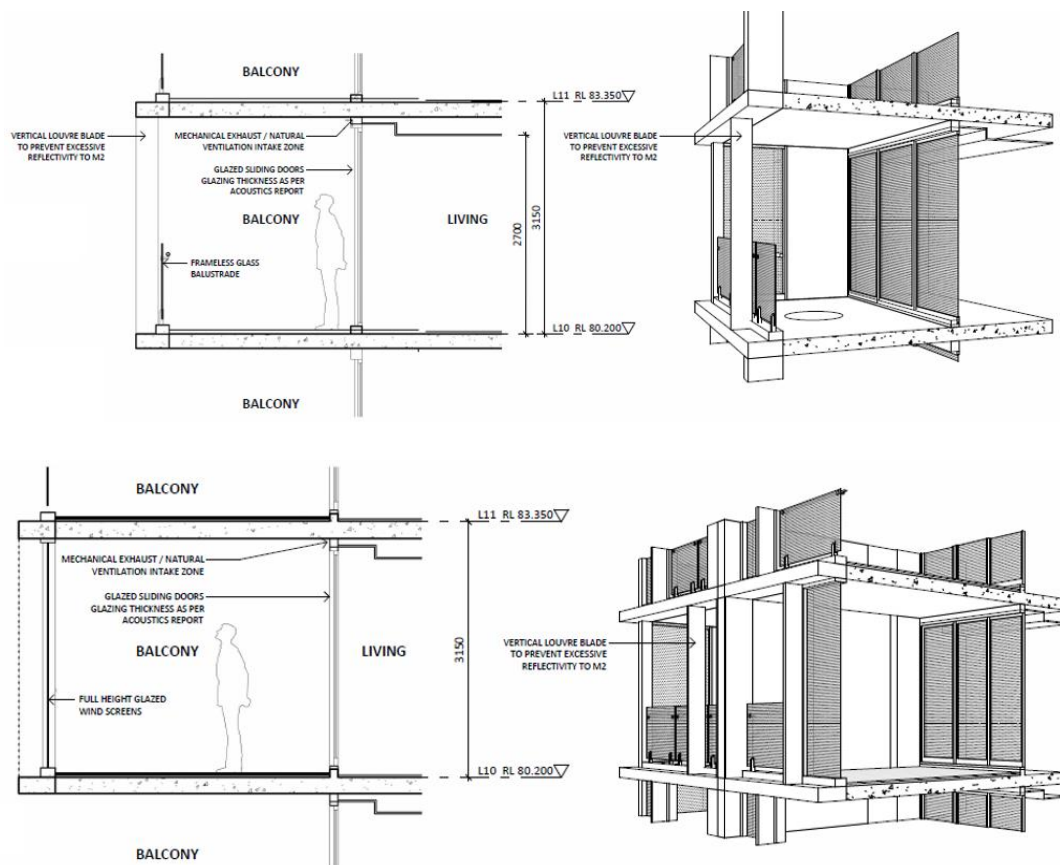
Extract of a section plans for a typical Building A apartment showing the structure, facade, balustrade, glazing, wind screens and the integration of any acoustic treatments, bushfire protection, drainage and services.
